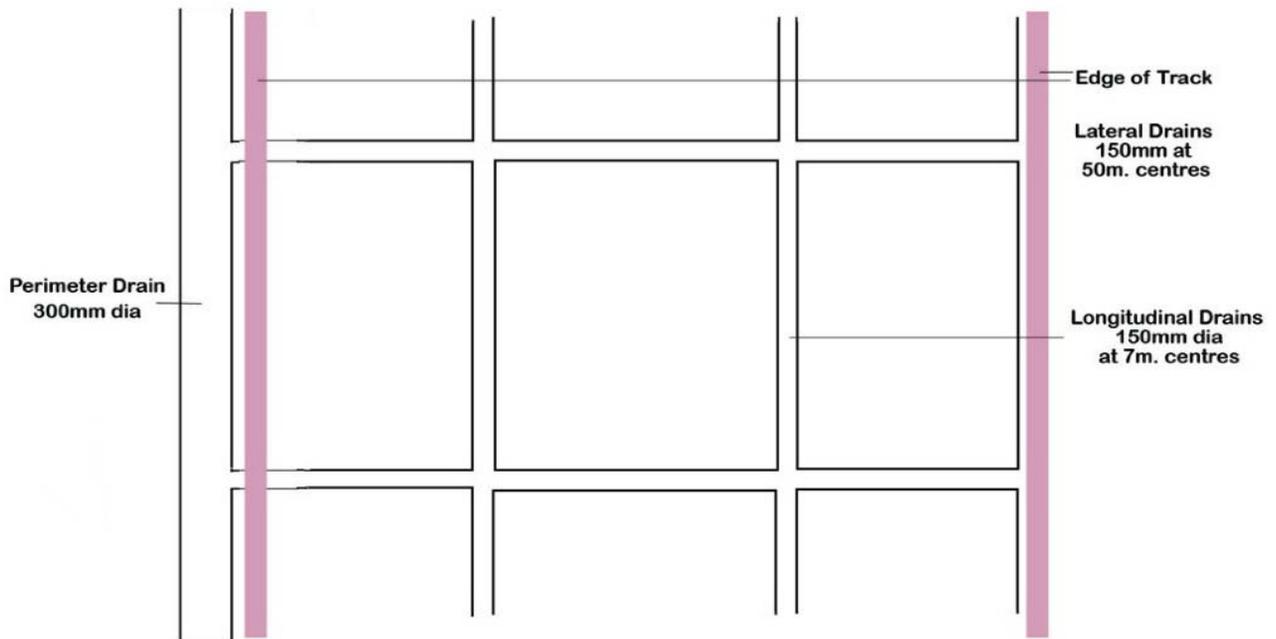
Plan view of drainage layout for a Cushion Track synthetic surface. Note: not to scale. (Source: www.cushiontrackfooting.com).
